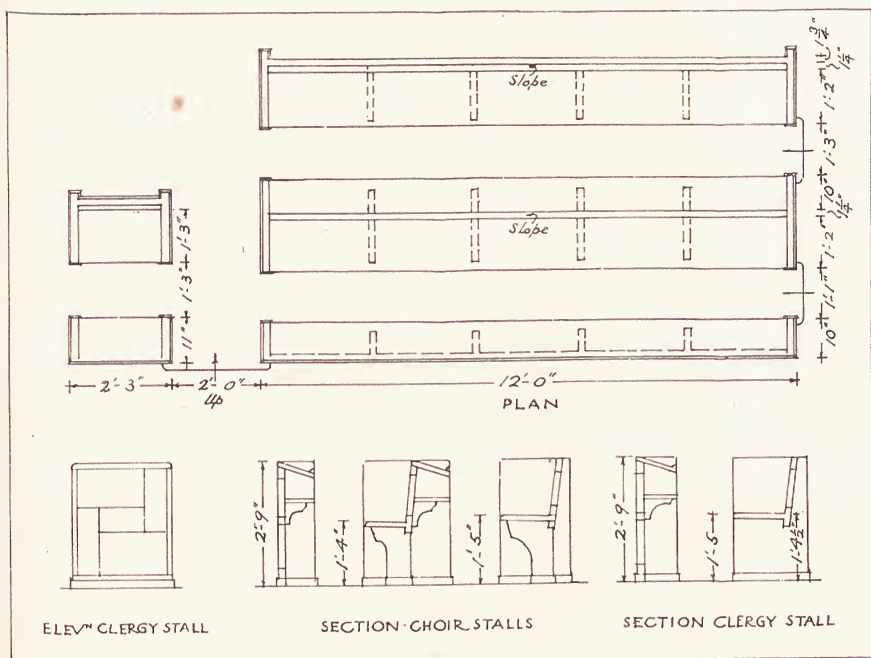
PLAN AND SECTION OF CHOIR STALLS
